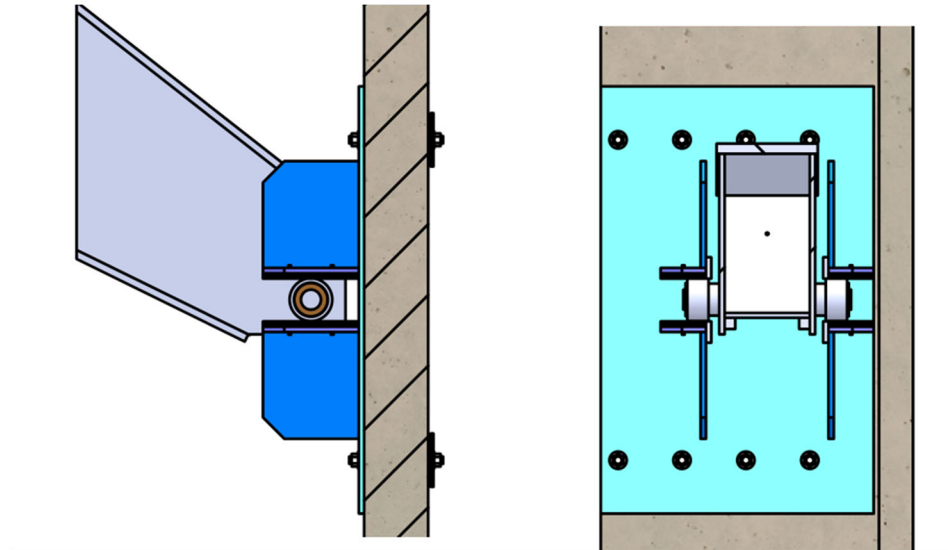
TRUCK BAY WALL ROLLER SYSTEM (ILLUST.)
